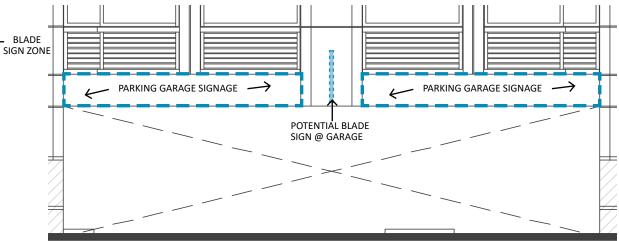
K STREET TYPICAL SIGNAGE ZONES
